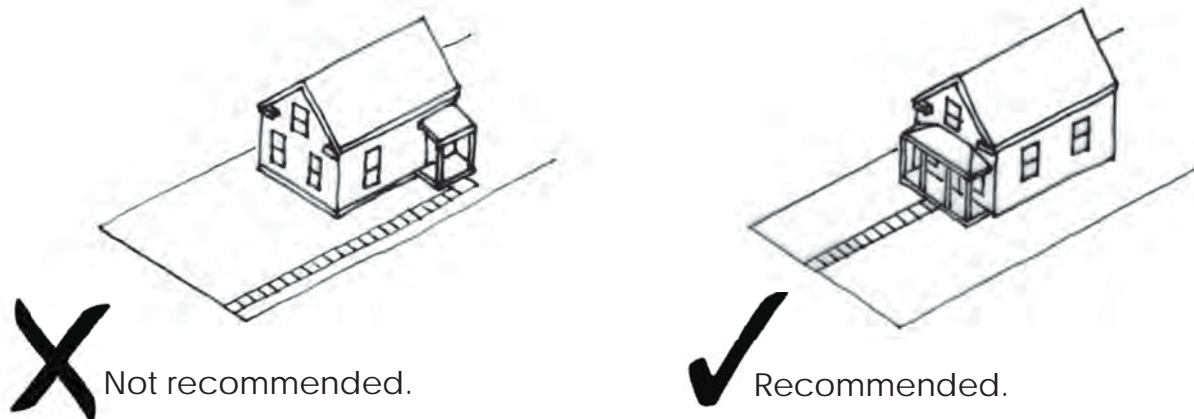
For additions or new construction the entrance should be oriented to the street in the local traditional manner and not onto the side or rear yard of the lot. *Source: JMA collection.
